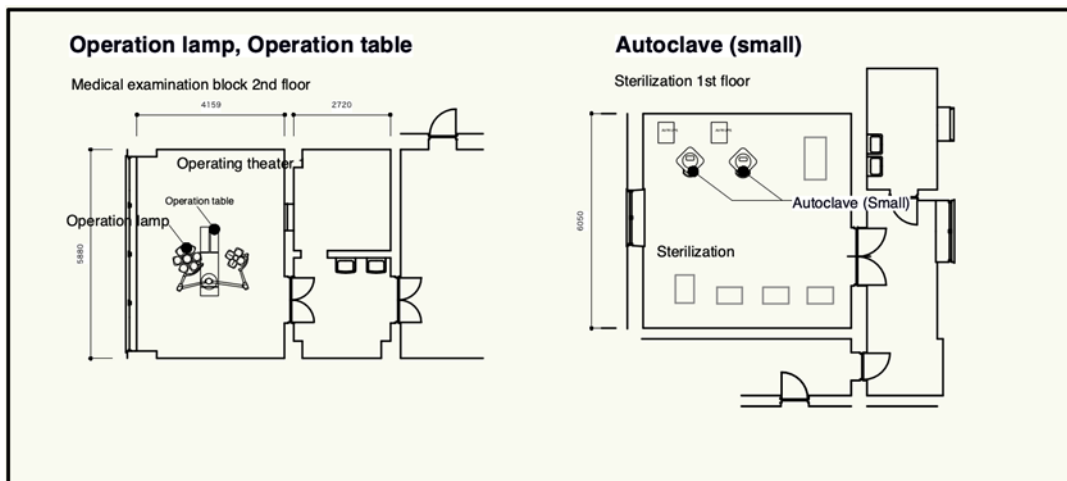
Ivanovka Village's Branch of Issyk-Ata General Practice Center layout plan
